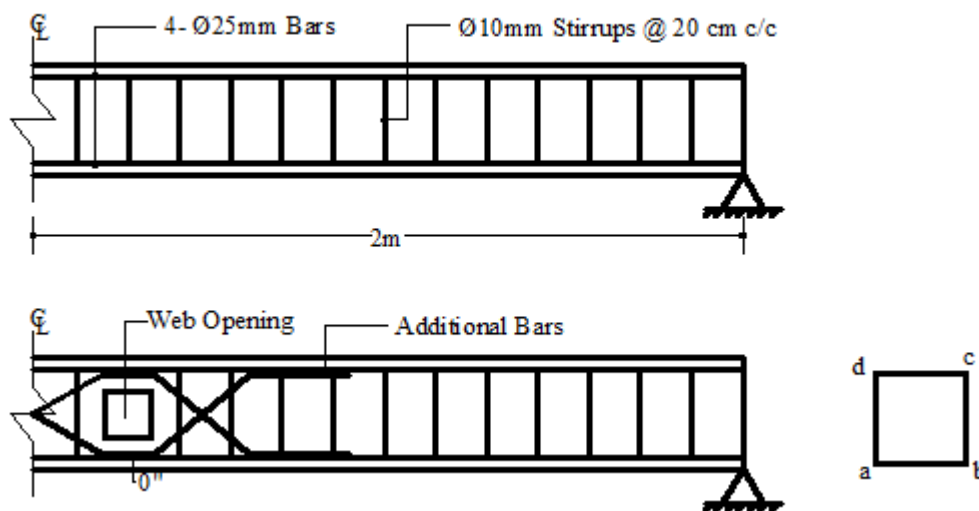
Details of Beam, Web Opening and Additional Reinforcement
